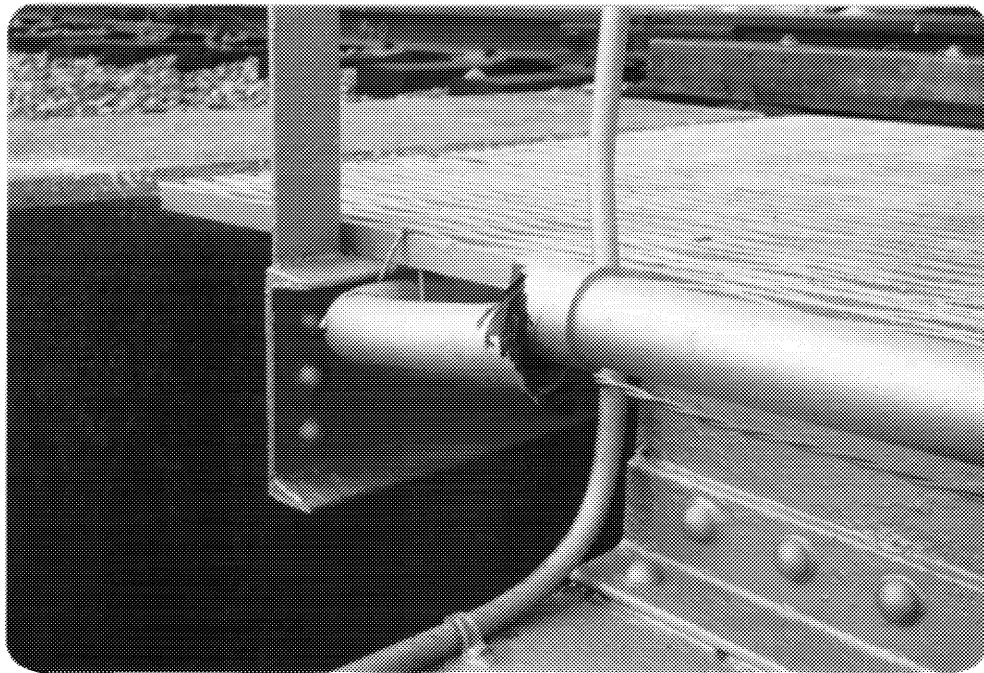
Broken plastic conduit and corroded support clamp on Abutment D.
